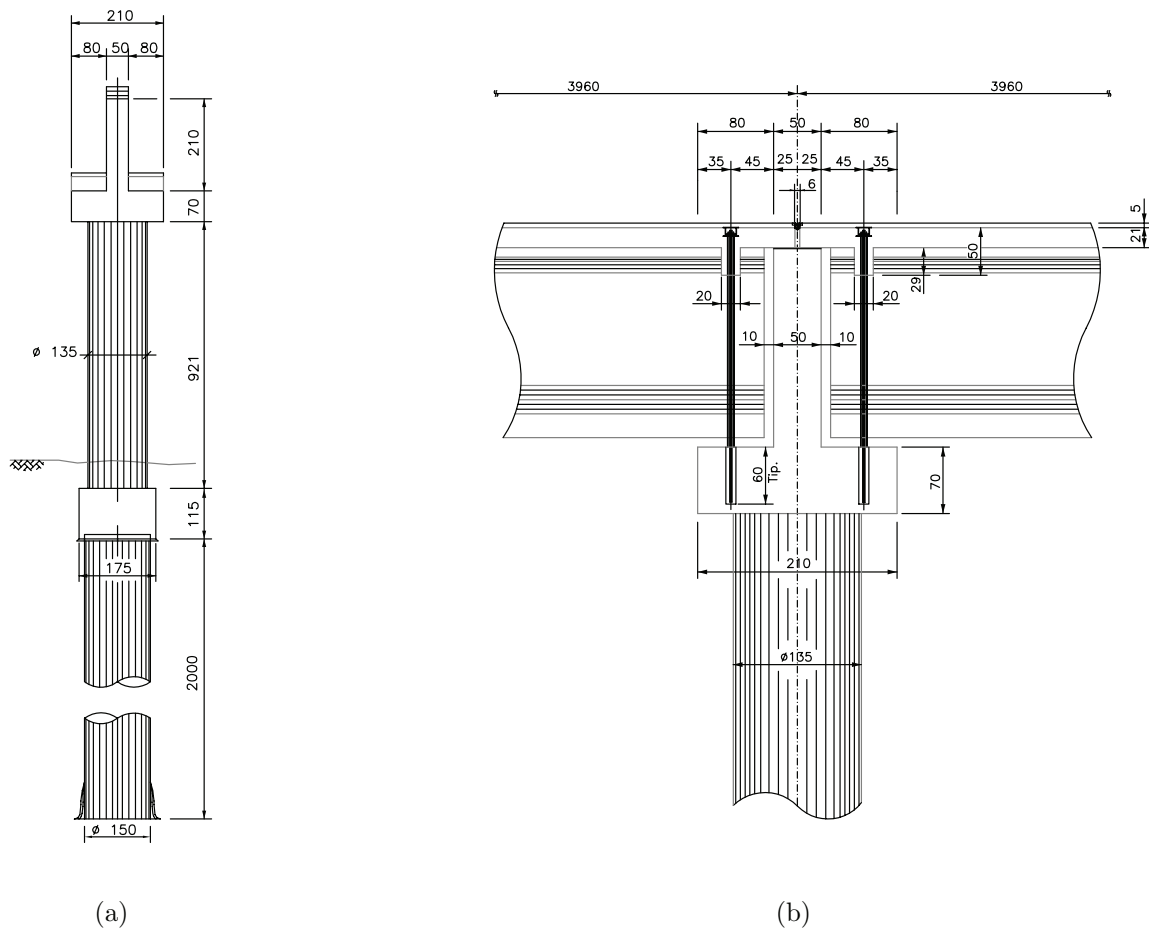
Schematic of (a) bridge approach pier. (b) deck to pier connection. (courtesy Ministerio de Obras Públicas, Chile)
